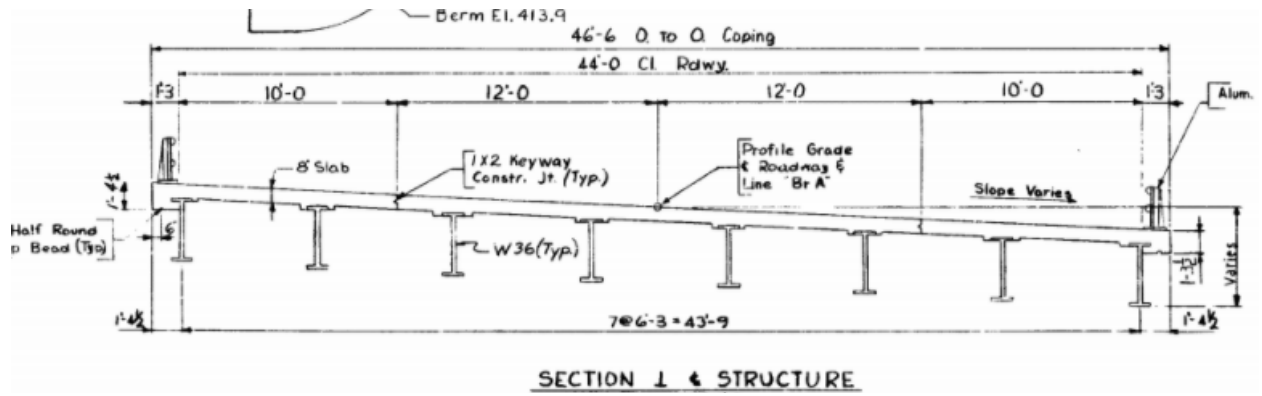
Typical Section of the Bridge (NBI 22190) (1981)
